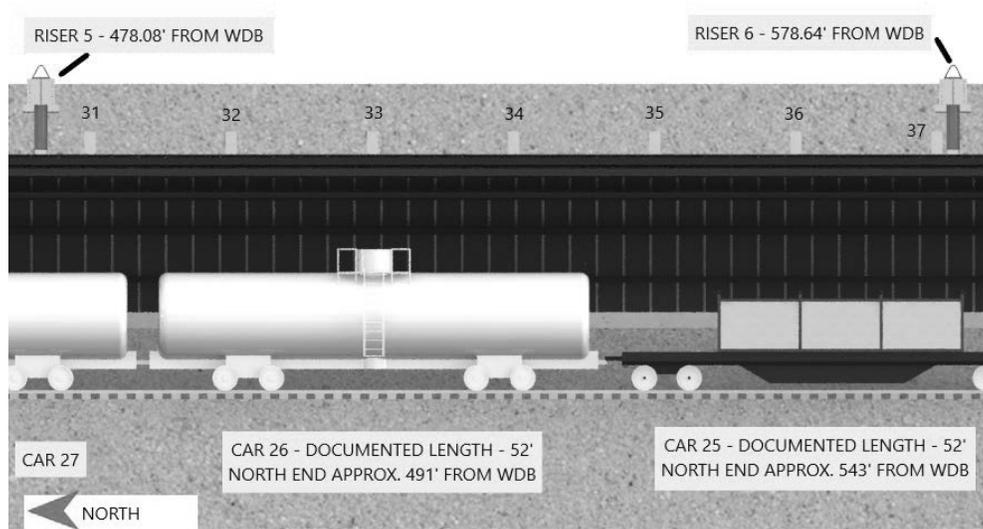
Riser 5 to Riser 6 Tunnel Section.
